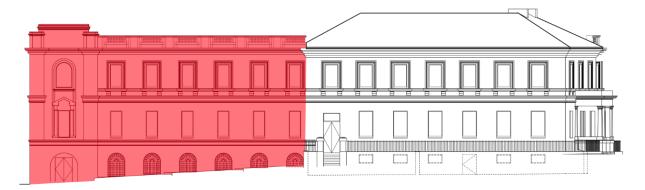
Diagram indicating building stage relevant to this section of the Historical Overview shaded red *Source: Urbis
